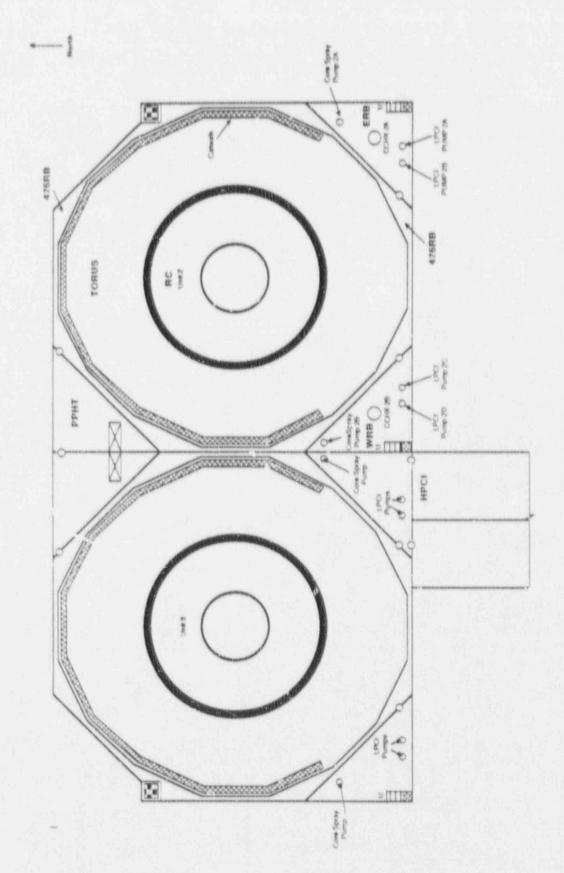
Dresden Units 2 and 3 Reactor Buildings, Elevation 476 6"
